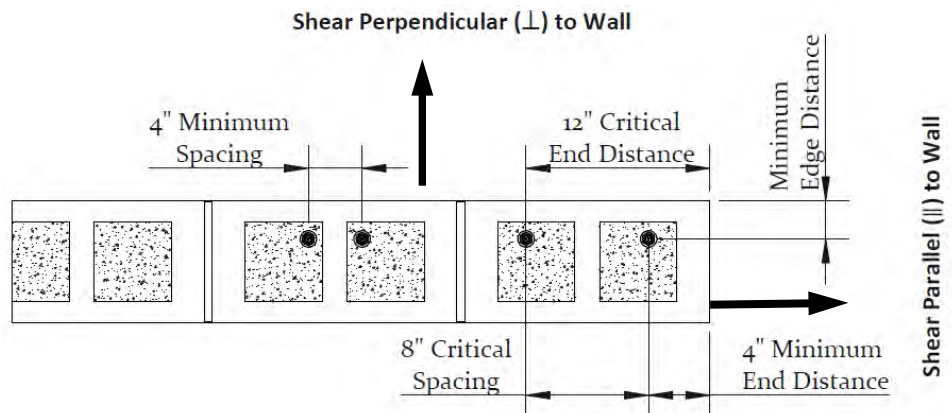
TRUBOLT+ WEDGE ANCHOR INSTALLED IN THE TOP OF FULLY GROUTED CMU CONSTRUCTION
